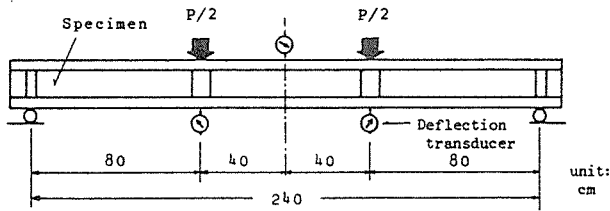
Method of bending test for I beams and box beams with LVL flanges and plywood webs.
